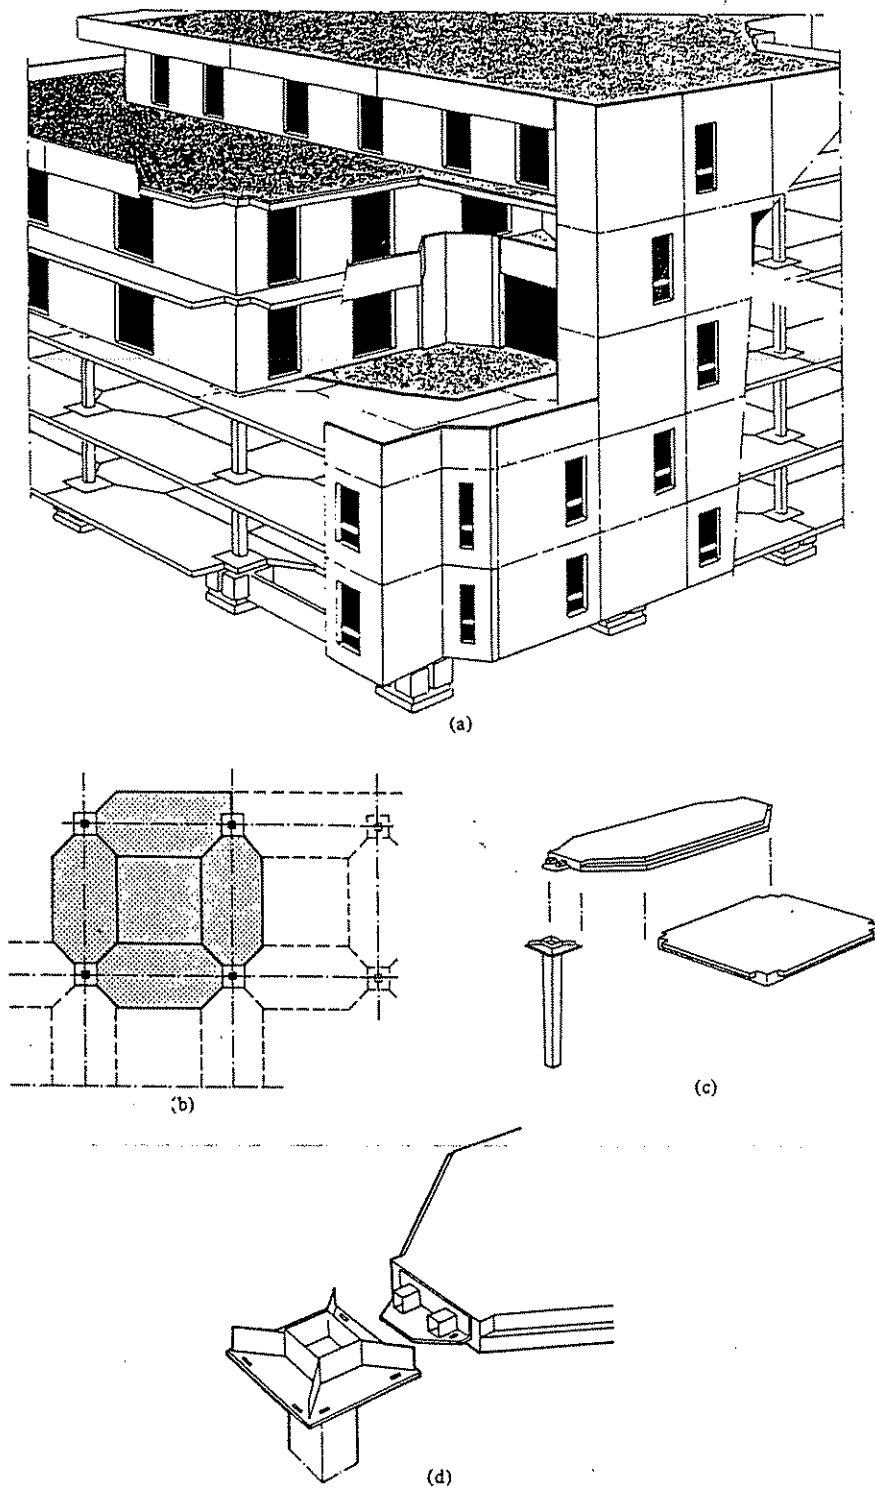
Etoile school system (France): (a) general scheme; (b),(c) structural elements; (d) connection detail.
